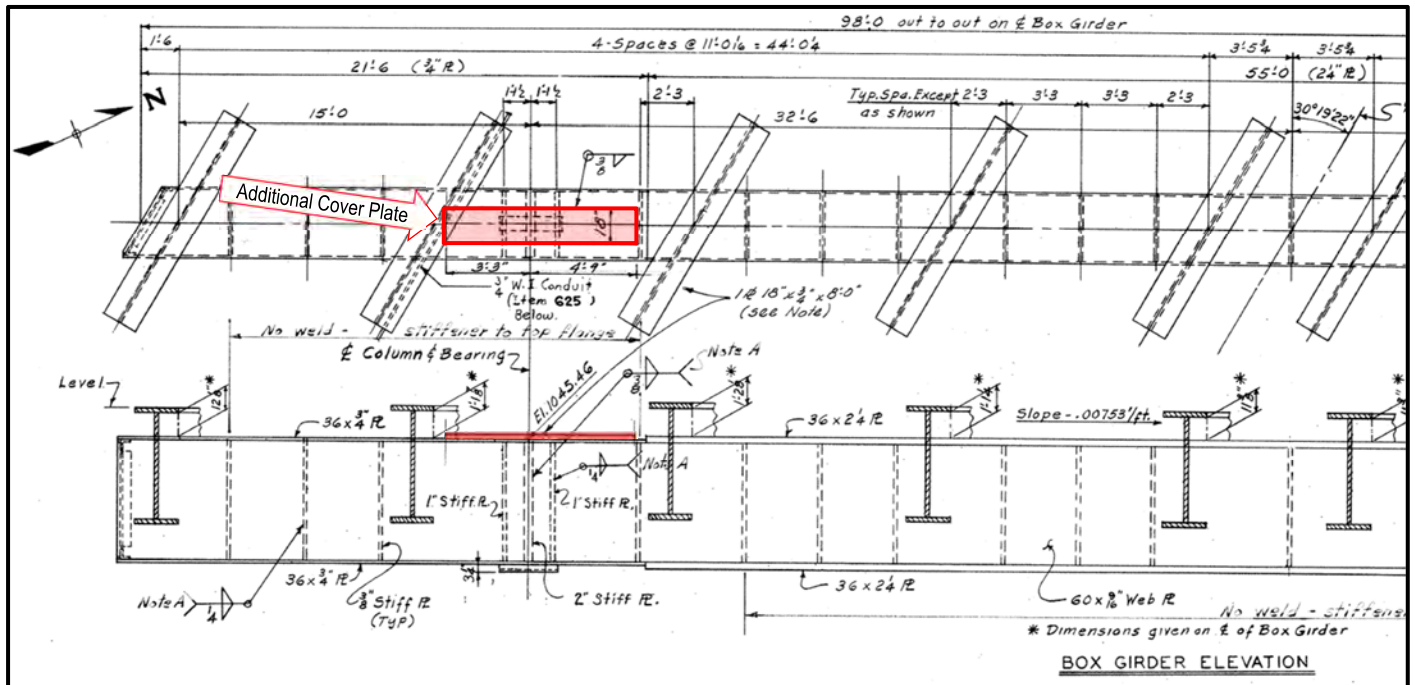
STA-077-0912 – Integral steel box girder partial original plan and elevation
